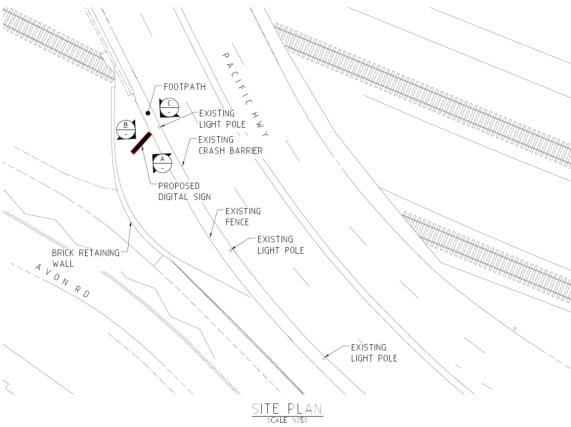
Site plan (Source: Dennis Blunt Consulting Engineers)
